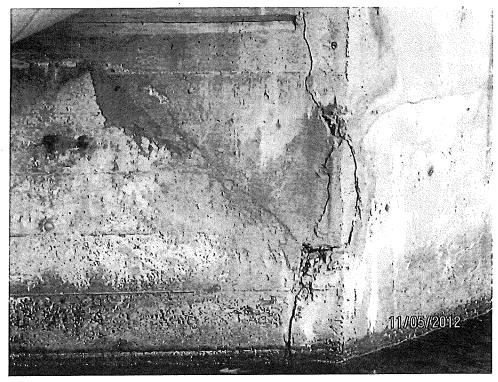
Full height crack and patched area to the South end of the East breastwall.
